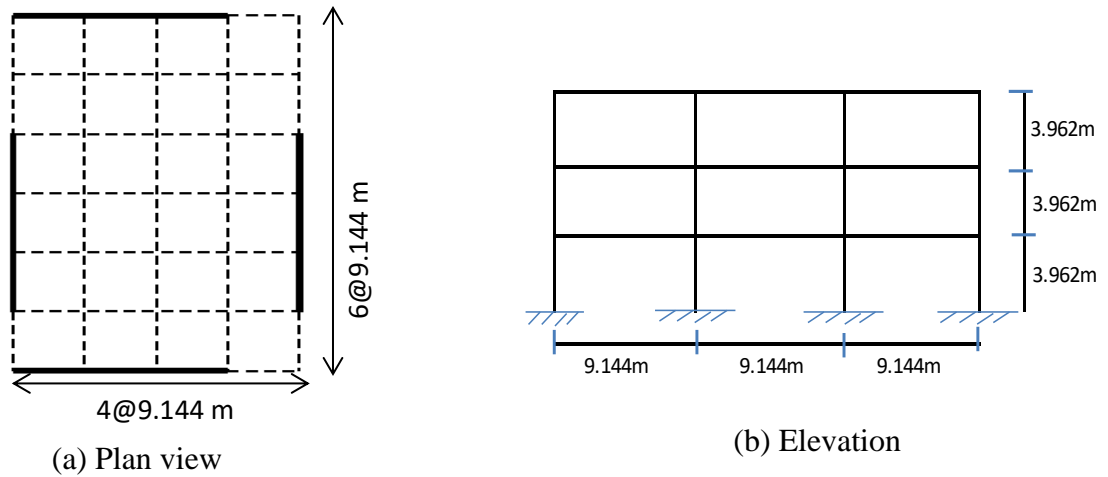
6: Plan and elevation of selected 3-storey building [20]
